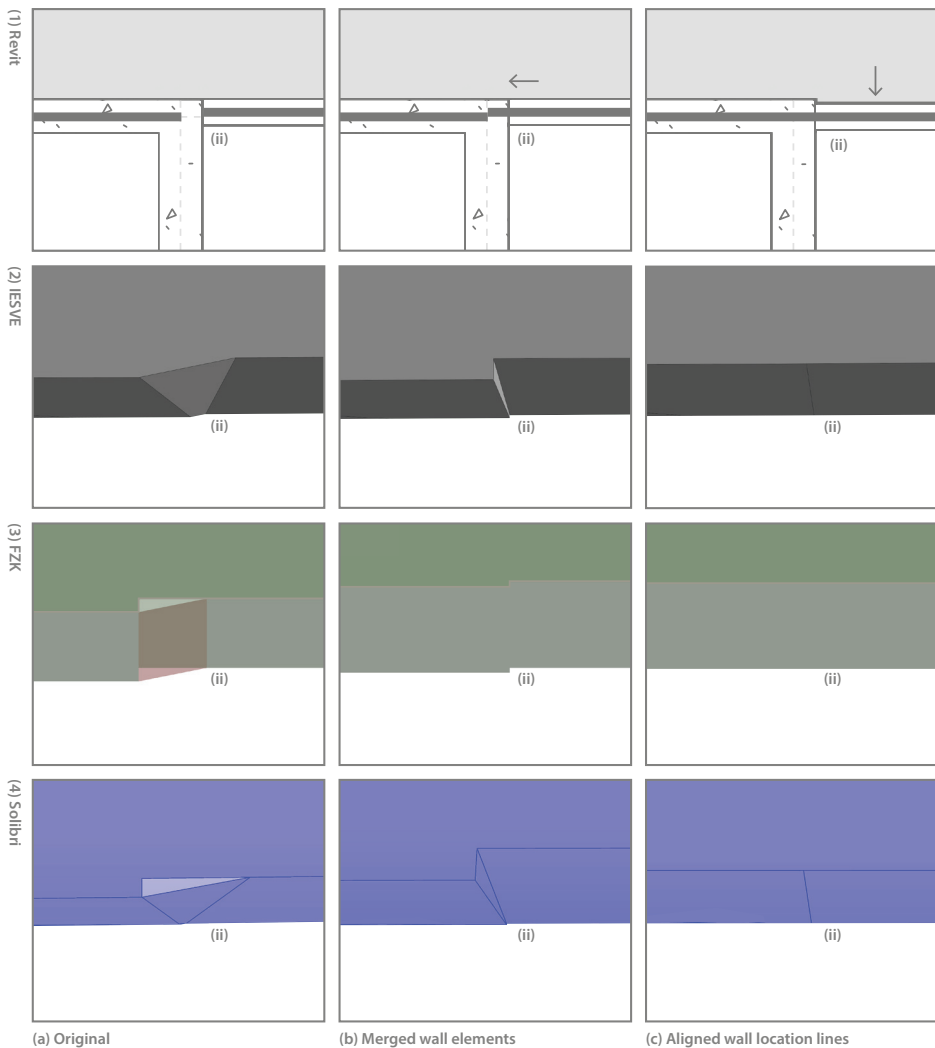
Comparing (a) original building model, (b) merged wall elements, and (c) aligned wall location lines.
